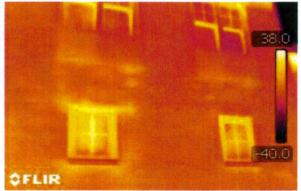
Exterior thermographic image shows warm air exfiltration in the field of the wall between 1st and 2nd floor windows and around the windows.
